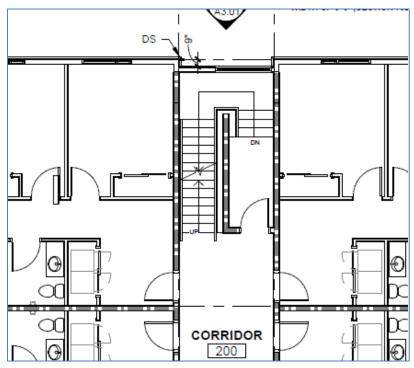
Internal stairway detail from 2<sup>nd</sup> floor plan of Building I
